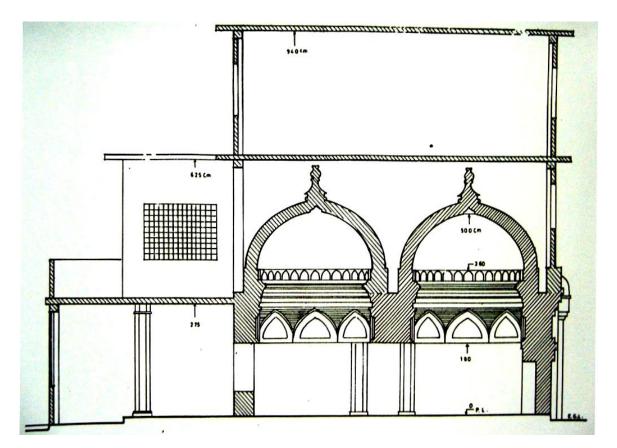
Section through the mosque showing the dome and the new construction (first floor)
